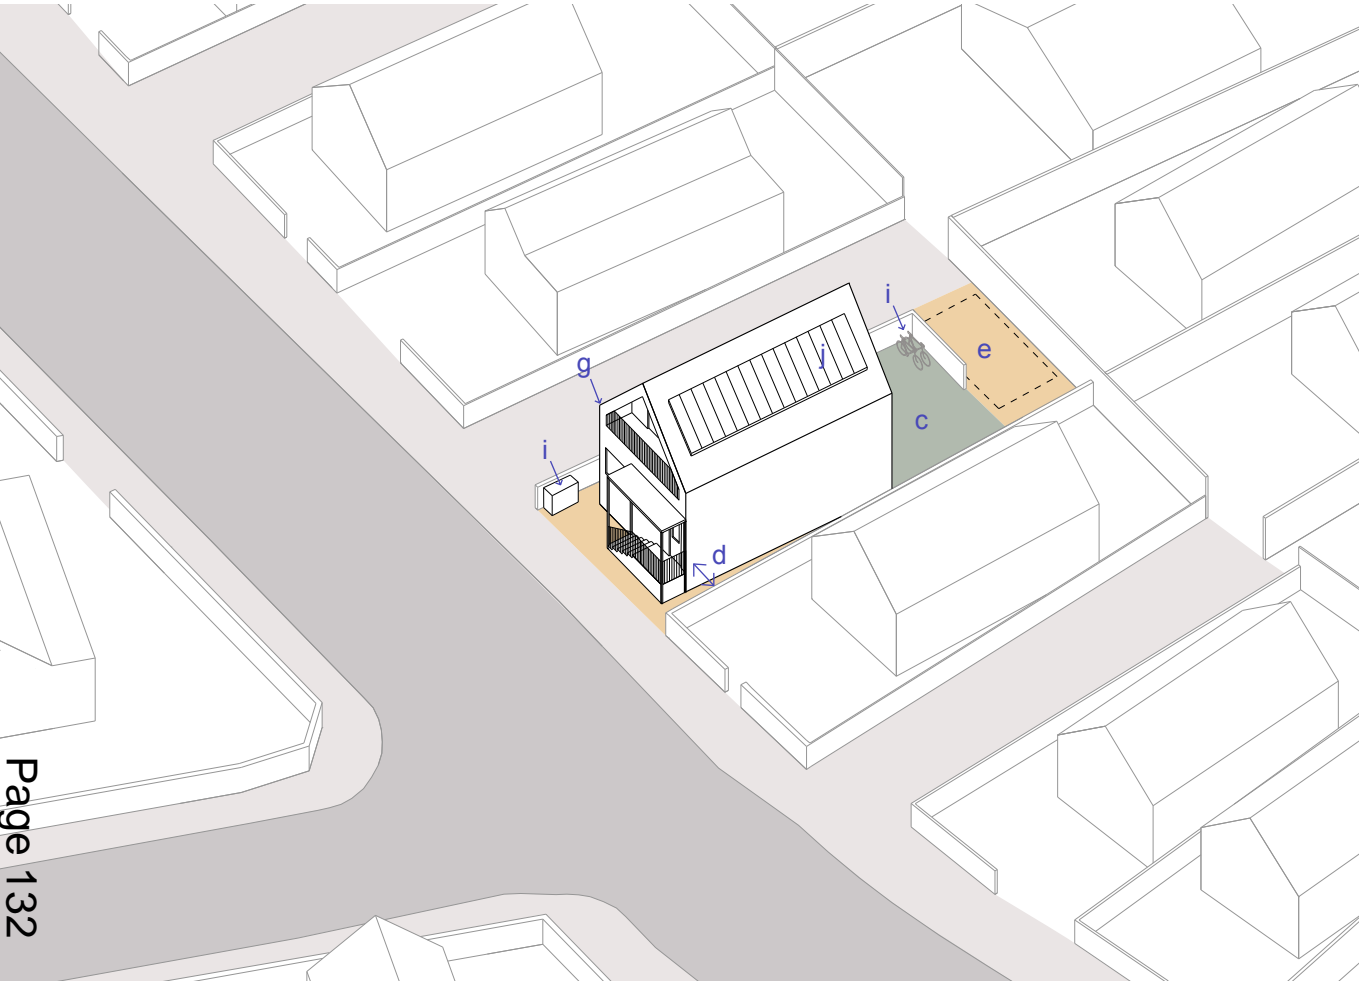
Plan showing application of guidance to typical tandem plots. Scale 1:500
